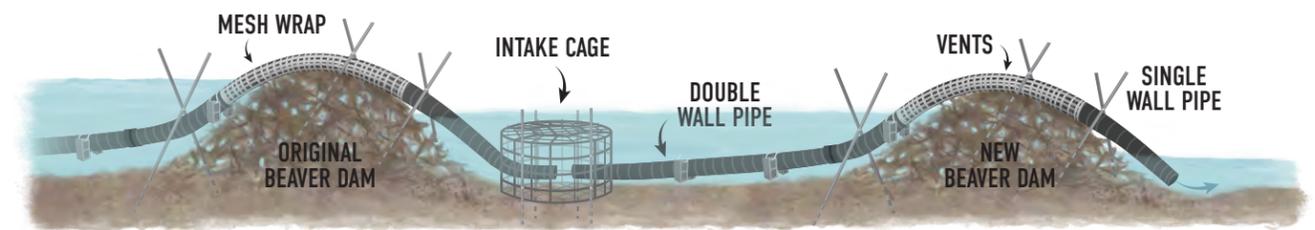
Pond leveler extension to accommodate additional downstream beaver dams.
